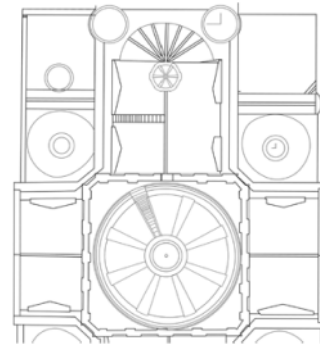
Quito, chapel of Sagrario, detail of roof plan, transept and presbytery domes (IMP 2009).
